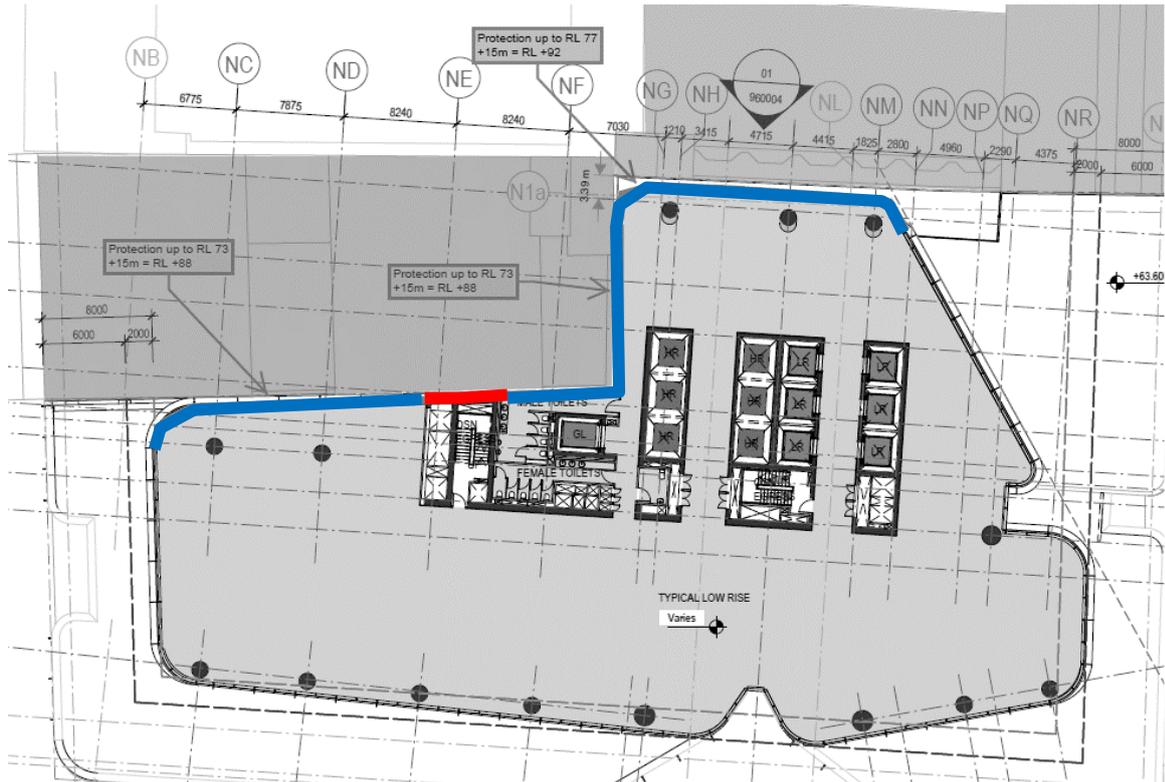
Indicative protection of external walls of OSD low rise levels 12-15
